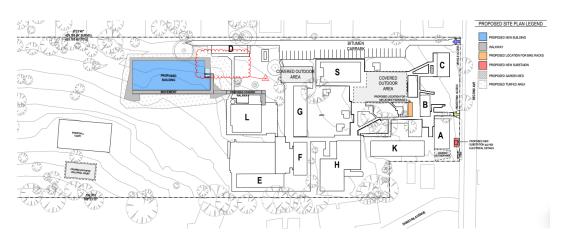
Proposed Scope of Works (Source: Fulton Trotter Architects, Proposed Site Plan (Rev 08))
